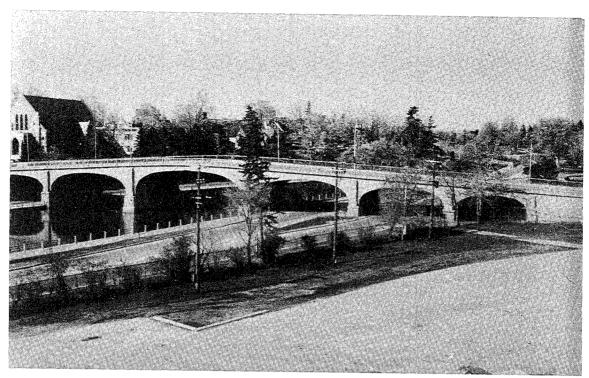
Bank Street Canal Bridge in Ottawa, designated as a heritage structure, is a typical example of where the hydrodemolition should be employed. It was not used because of environmental restriction related to waste water disposal.
